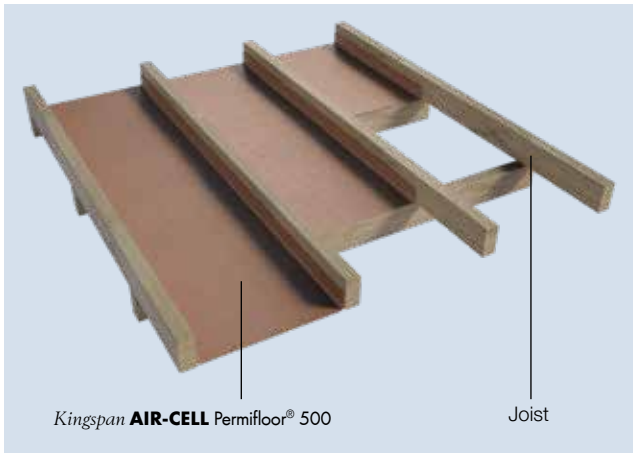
Pre-cut Kingspan AIR-CELL Permifloor® 500 installed between floor joists
